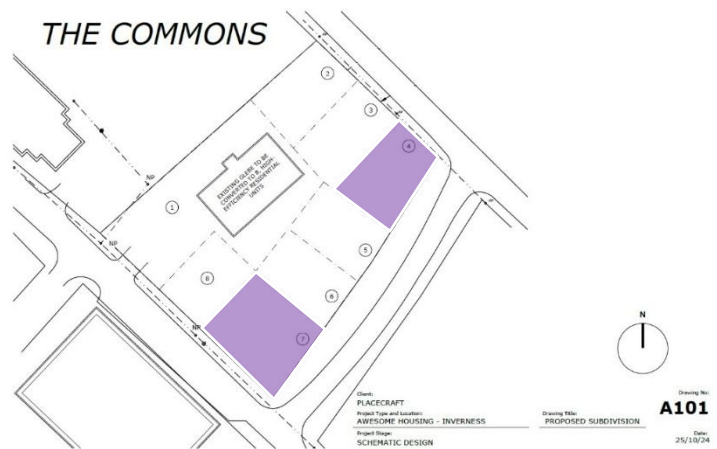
Site plan showing corner lots with proposed mixed-use buildings
